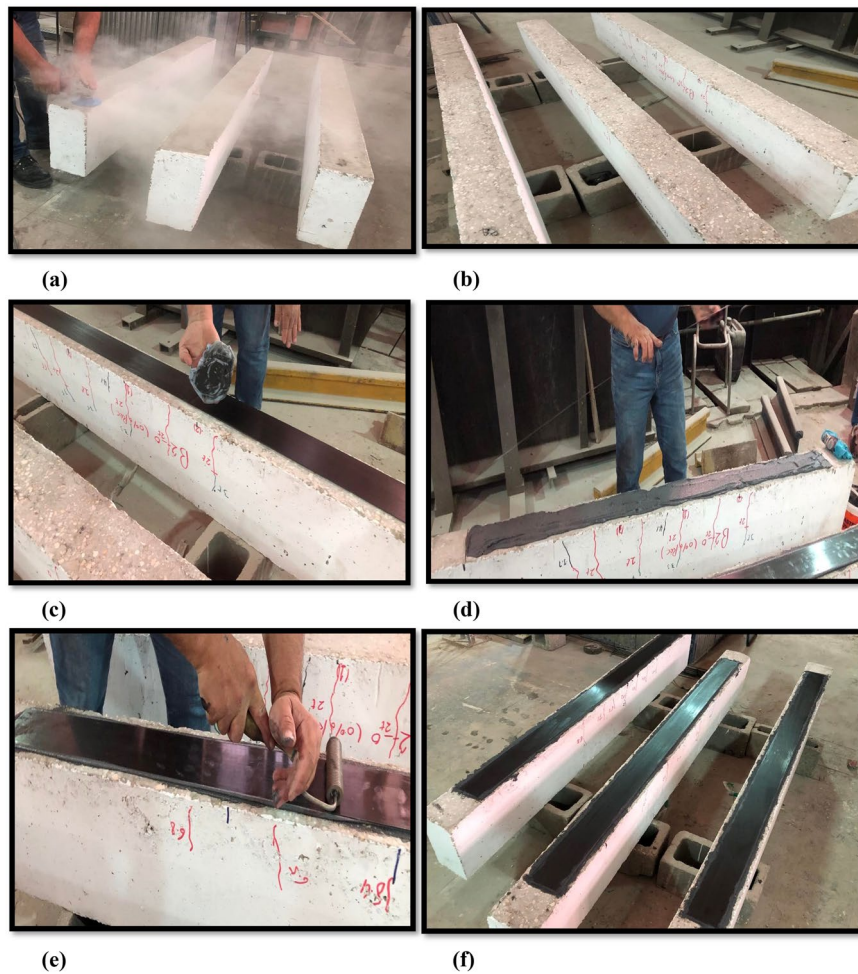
Steps of applying CFRP laminates on the strengthened beams. a Smoothing and cleaning the surface of the concrete beam. b Free surface after cleaning. c Using toner and cotton to remove any contamination. d Putting the epoxy on the surface of the beams before attaching the CFRPP laminate to it. e Squeeze out the epoxy under the laminate with a solid roller. f The beams were left with the CFRPP laminates that attached for at least 72 h to get full curing
